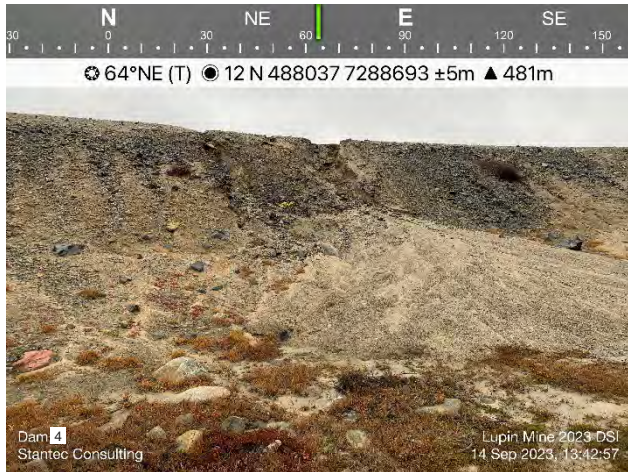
Overview of an existing erosional feature on the downstream embankment at Dam 4.
